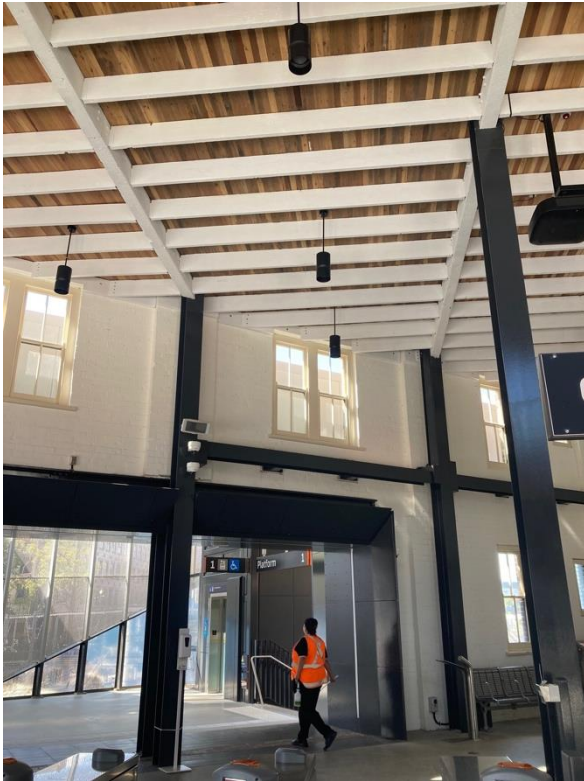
Little Eveleigh Street entrance, showing reused timber from the old building on the ceiling.
